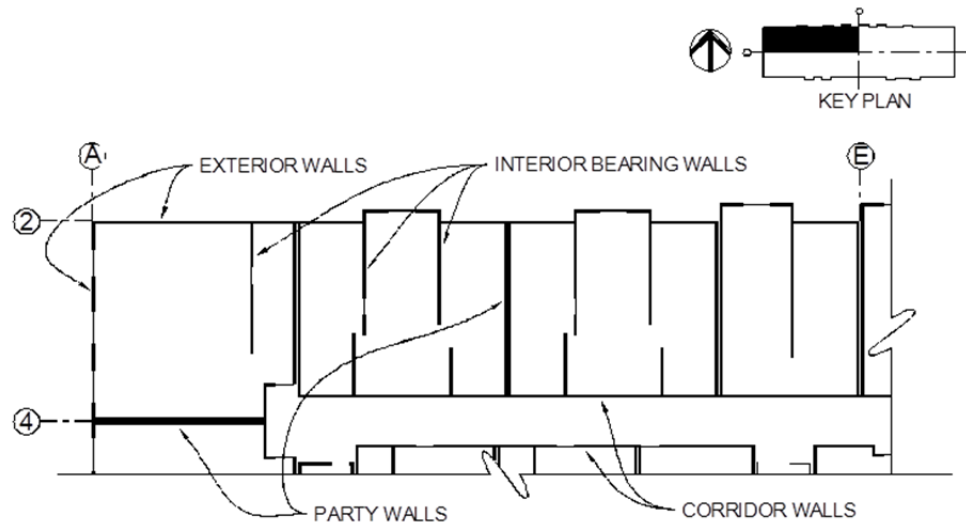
Plan of shear walls (northwest corner) for wind design.
